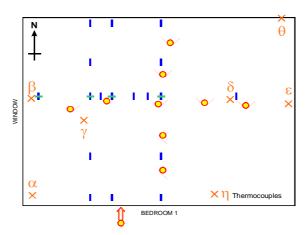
Locations of structural instrumentation Replace with CAD equivalent
